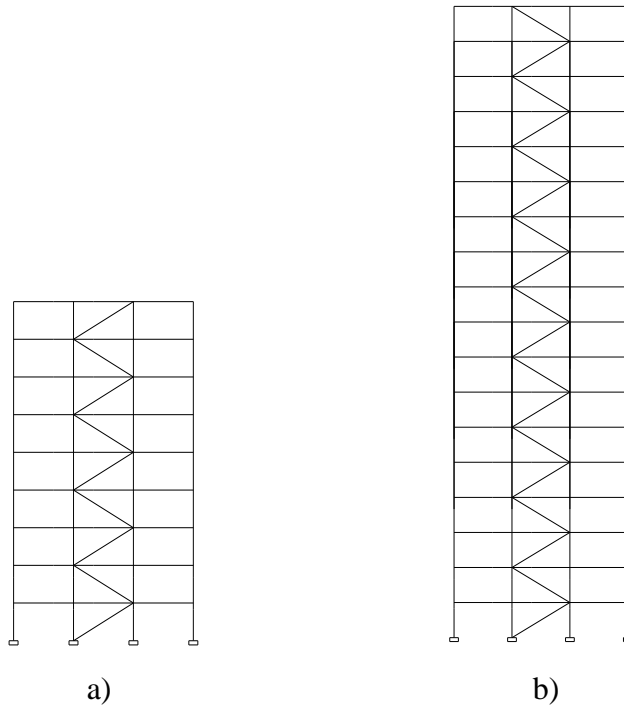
Frame elevations of a) 9 and b) 18 story BRBFs under investigation
